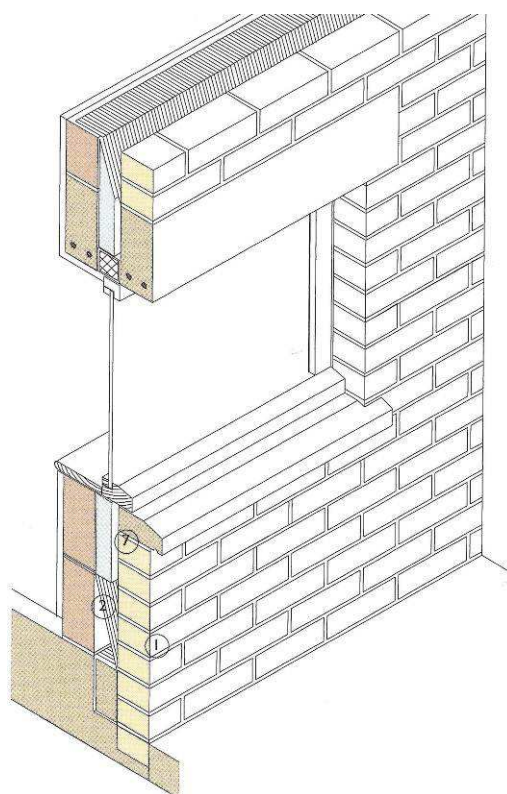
Brick cavity wall with an apparent wall element: 1 - brick veneer; 2 - inner brick leaf; 7 - thermal insulation partially filling the cavity (Watts, 2005)
